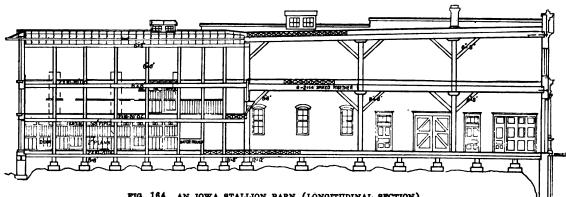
AN IOWA STALLION BARN (LONGITUDINAL SECTION).
